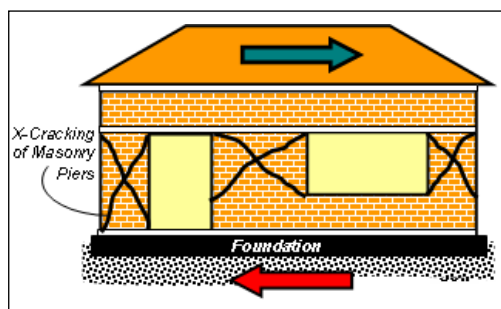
Typical Shear Failure in Load Bearing Walls
